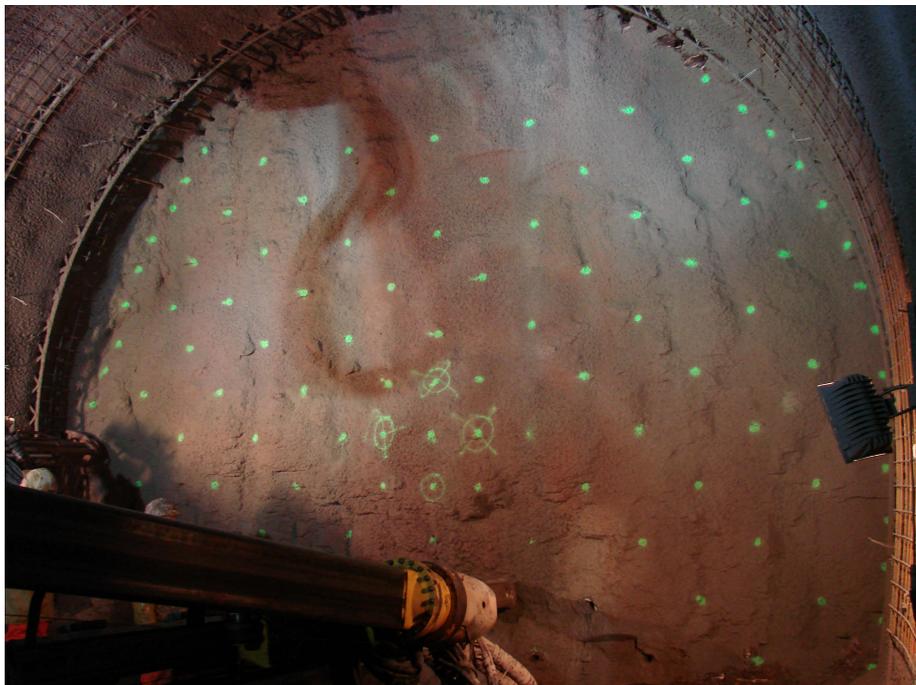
Drill pattern on the reinforced tunnel face (roof section) marked by a laser theodolite
